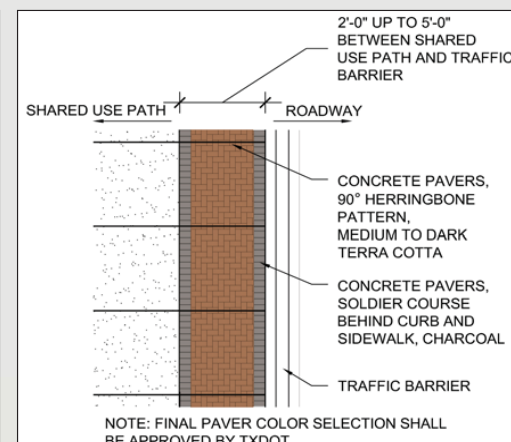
Shared Use Path Roadway Buffer, 2 Feet to 5 Feet, from Traffic Barrier
